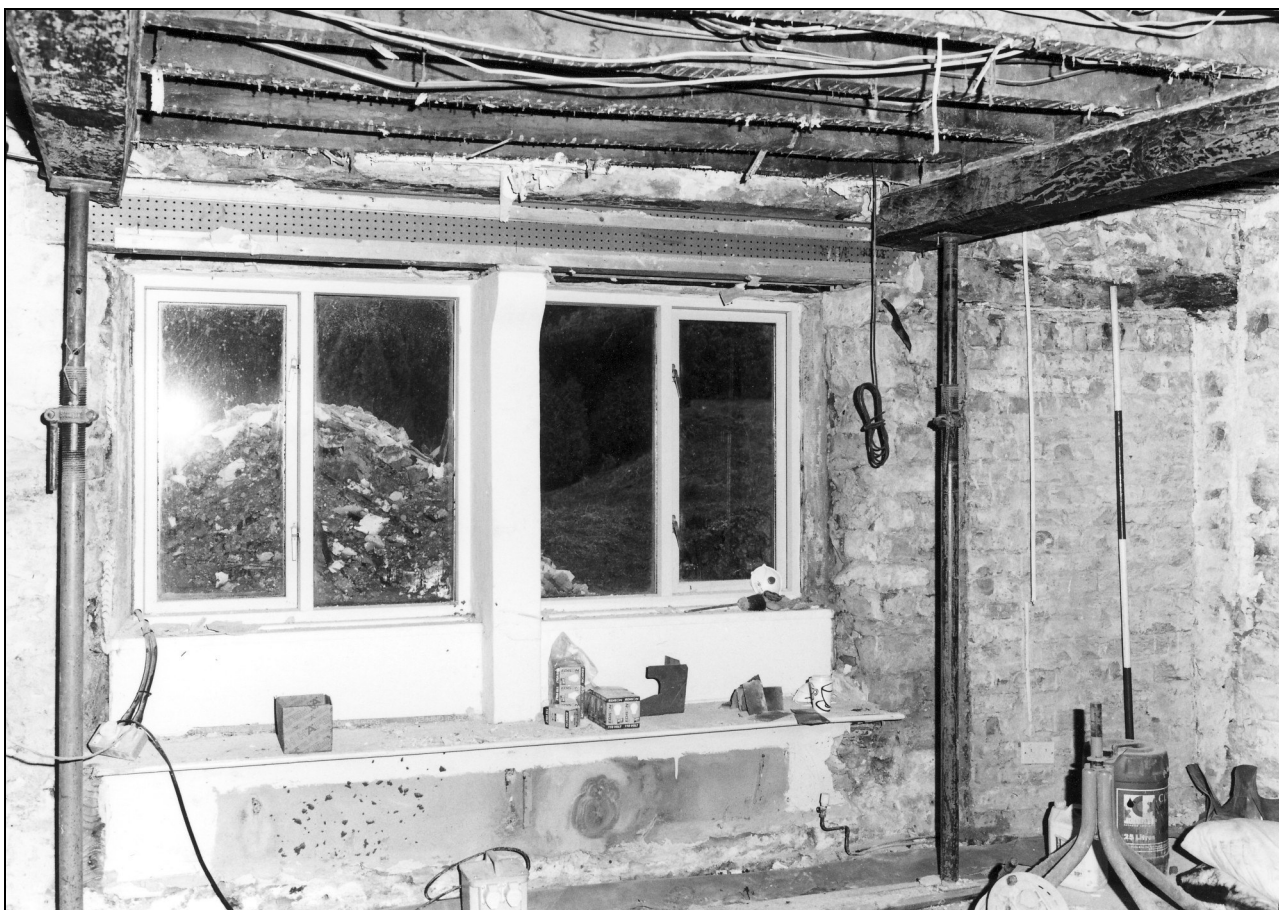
Front window with king mullion in ground floor room 3, east end of house
